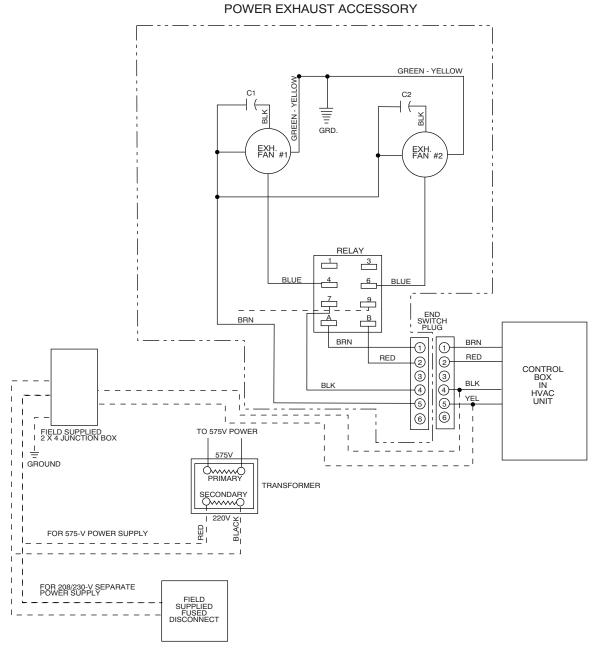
Power Exhaust Wiring - 208/230-v and 575-v Units
